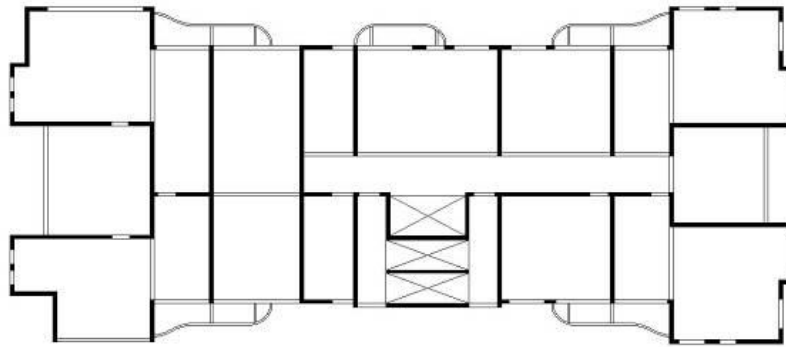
Floor plan for a typical Chilean high-rise building. The infilled lines represent reinforced concrete shear wall, whereas the open lines represent non-structural walls. Notice that most wall are shear walls. This is very different from typical US high rises where most walls are not structural.
